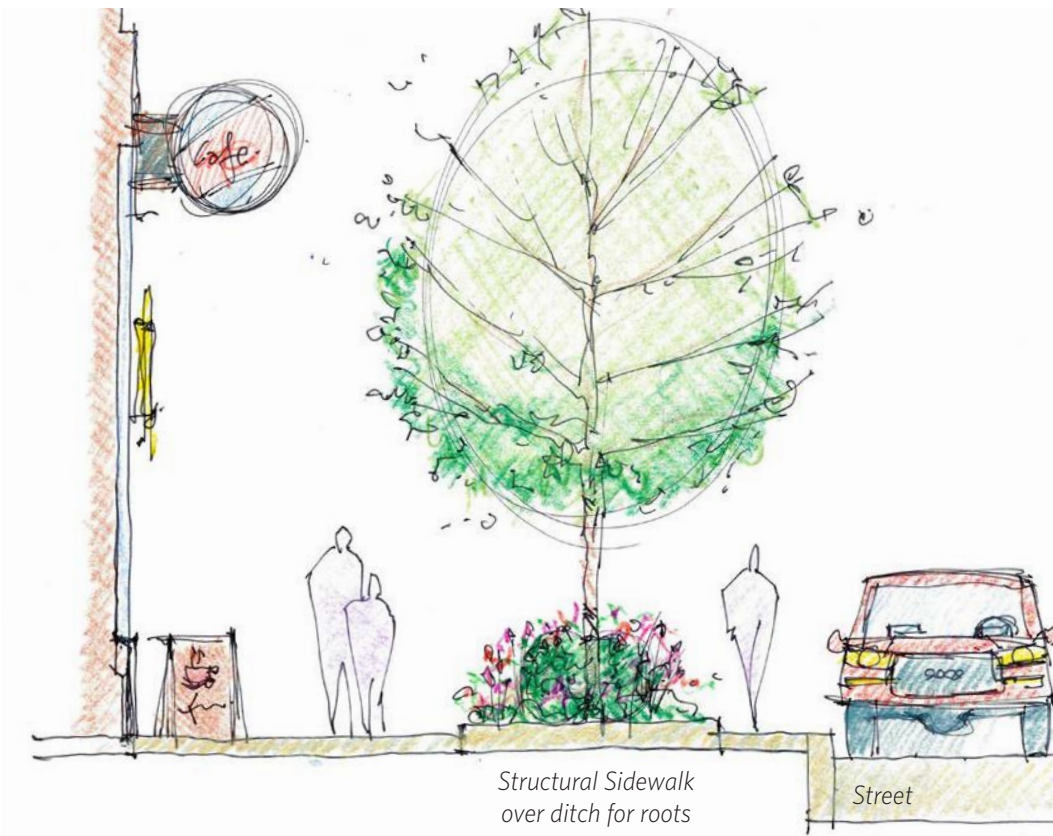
Street Tree Planting Details with Structural Sidewalk — Section
